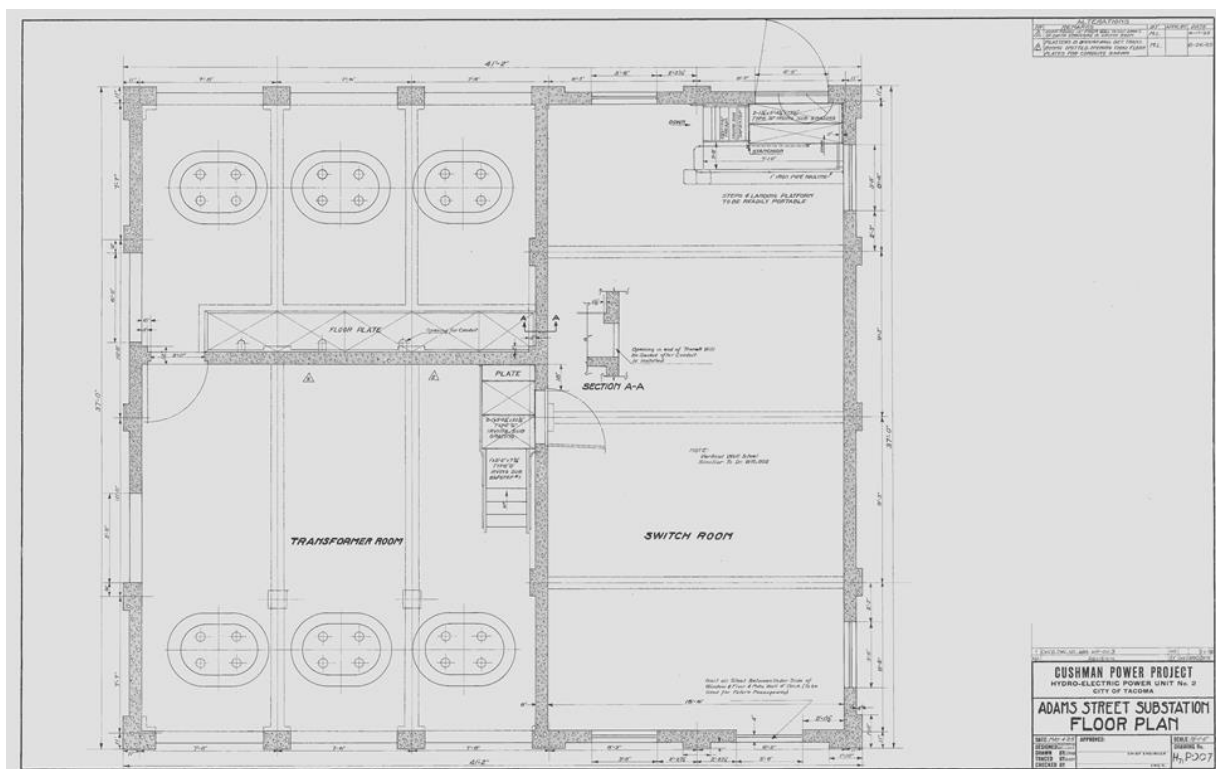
Adams St. Substation, floor plan, 1925. Courtesy of Tacoma Power.
